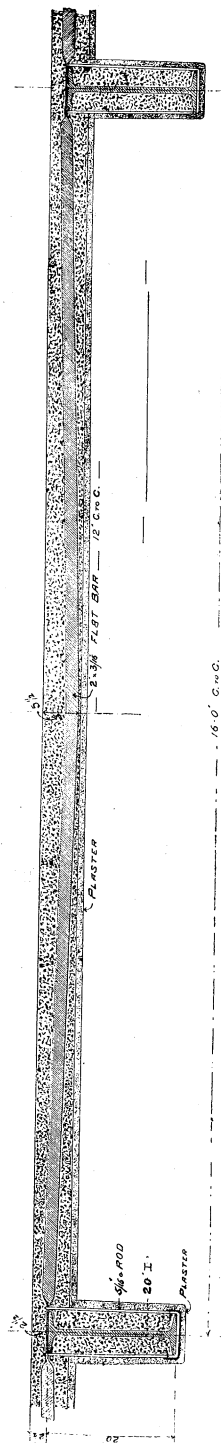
Steel Concrete Floor, After the Roebling System.
